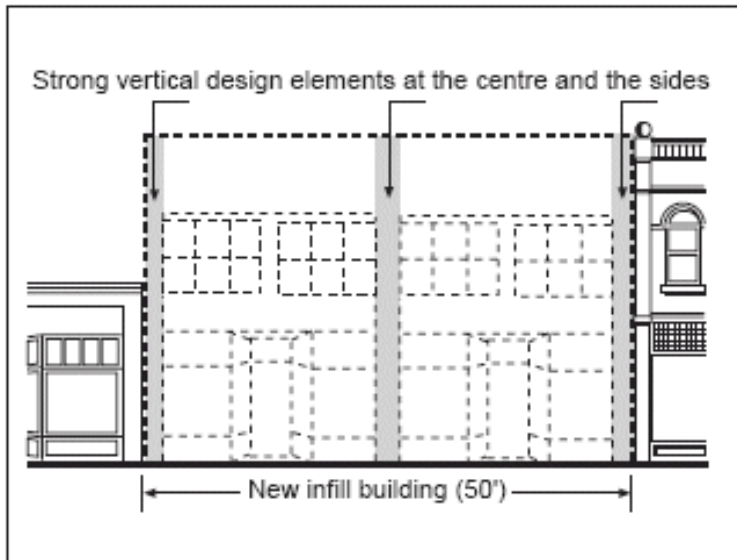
shows how vertical elements can be used to break up the width of a building façade to create the impression of two smaller buildings consistent with the width of storefronts of other buildings on the block face.
